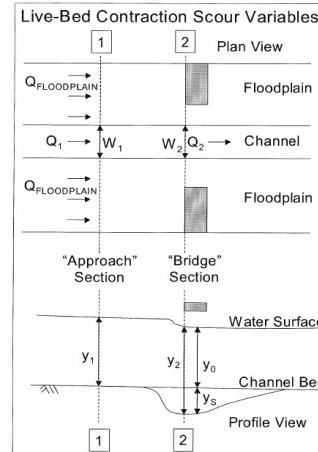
Case 2b: Bridge abutments and/or piers constrict flow.
